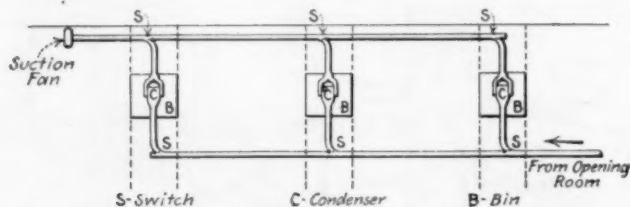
PLAN SHOWING ARRANGEMENT IN PICKER ROOM WITH MECHANICAL CONVEYOR OMITTED
